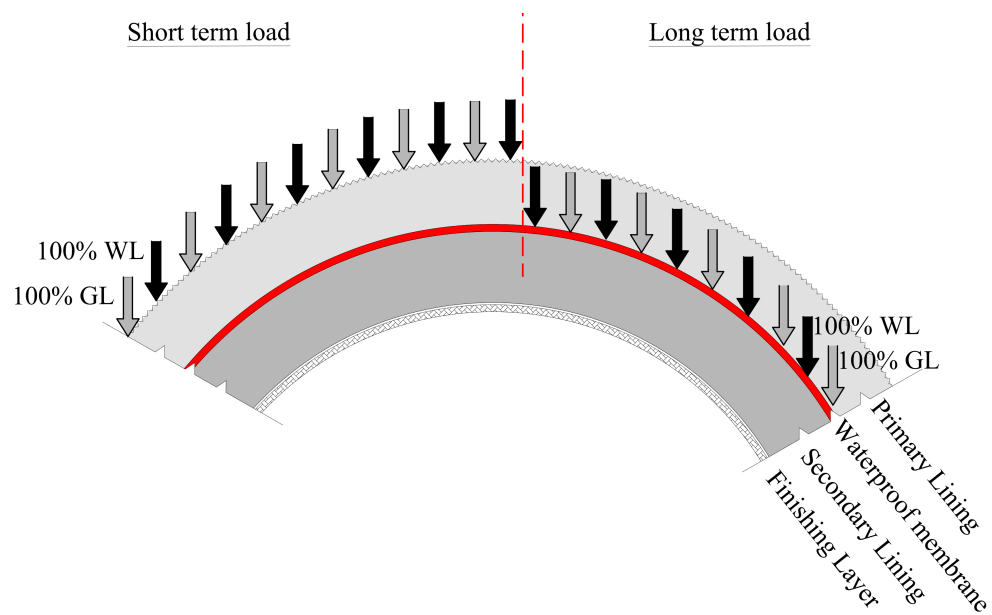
Typical Cross-section and loading configuration of a double shell lining.
